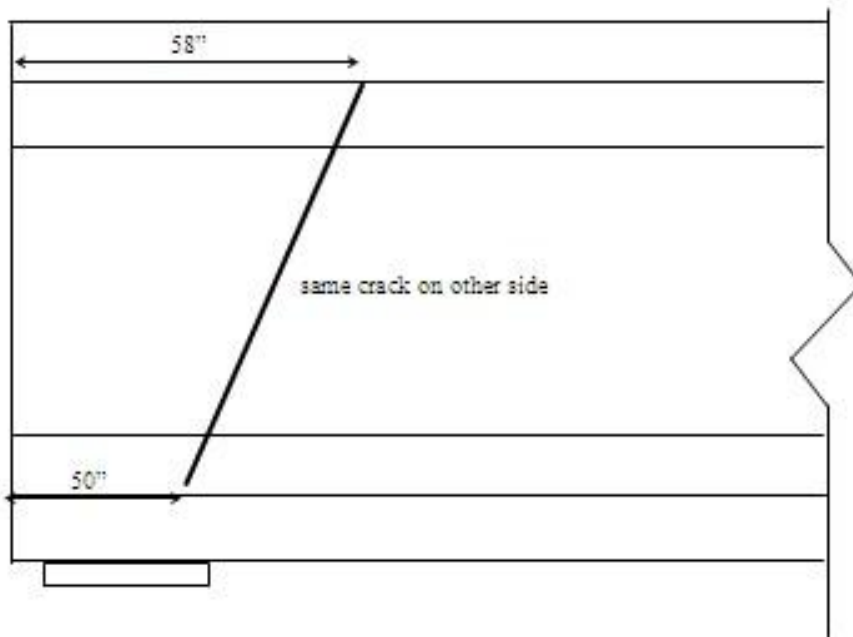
Crack diagram for girder on exterior of south side, south face, west abutment (#12773).
